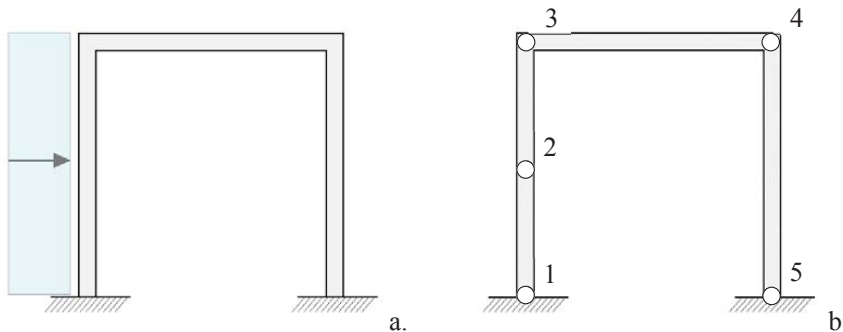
Concrete frame structure subjected to blast loading (a) and locations and labeling of plastic hinges (b).
